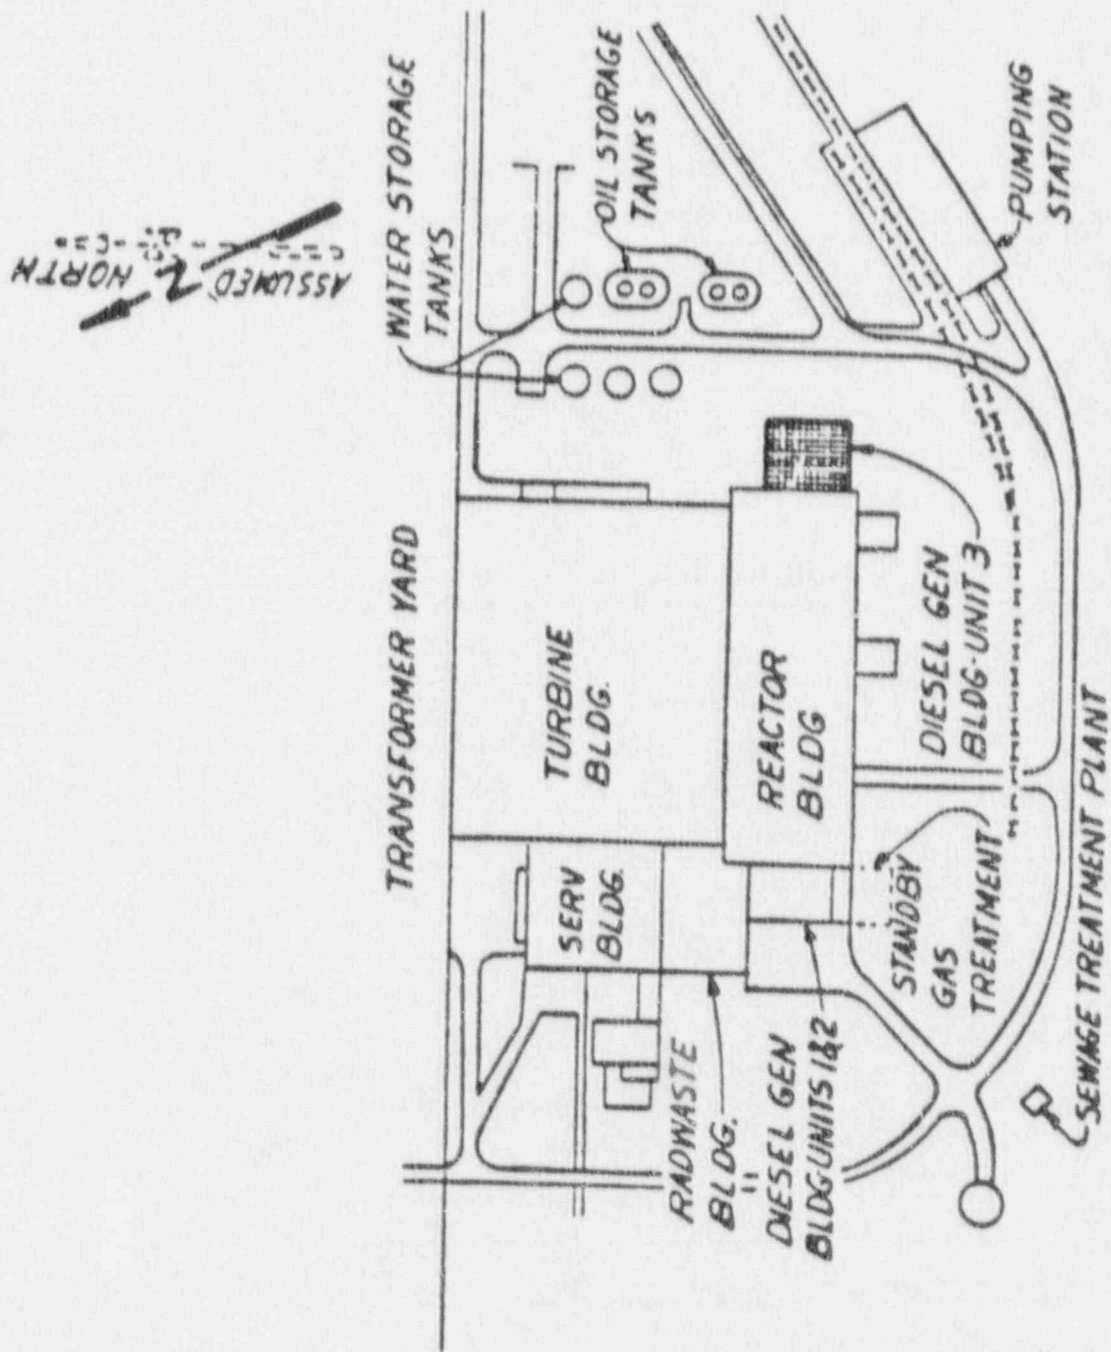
General Arrangement of Major Buildings at the Browns Ferry Site
